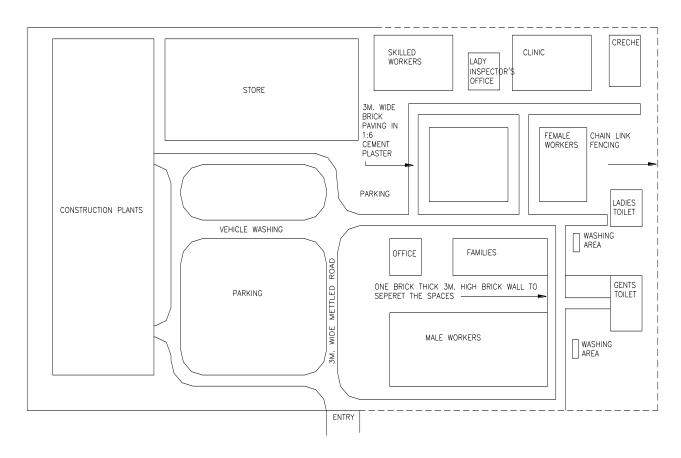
FIGURE A: TYPICAL LAYOUT OF CONSTRUCTION CAMP
